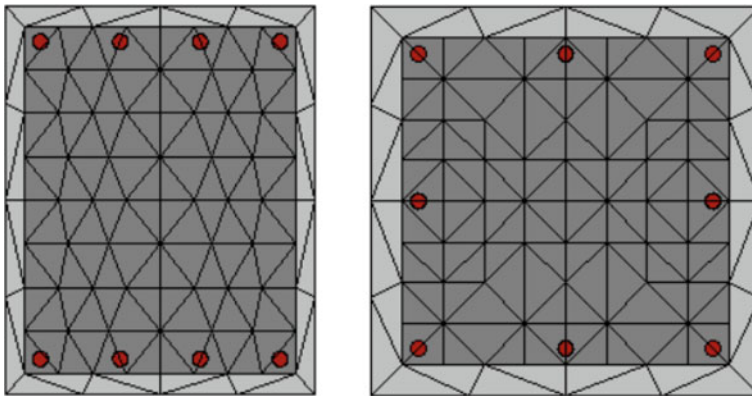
Sectional discretization of beams and columns in SeismoStruct
